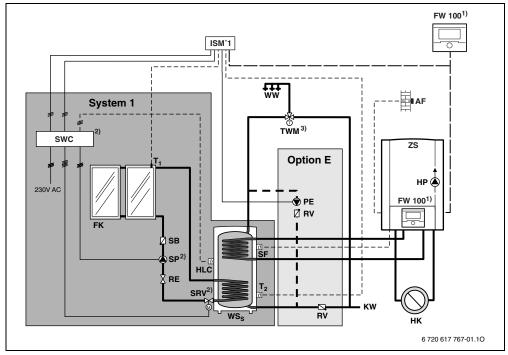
FW 100 and CDi System Boiler with optional integral diverter valve and solar installation.
